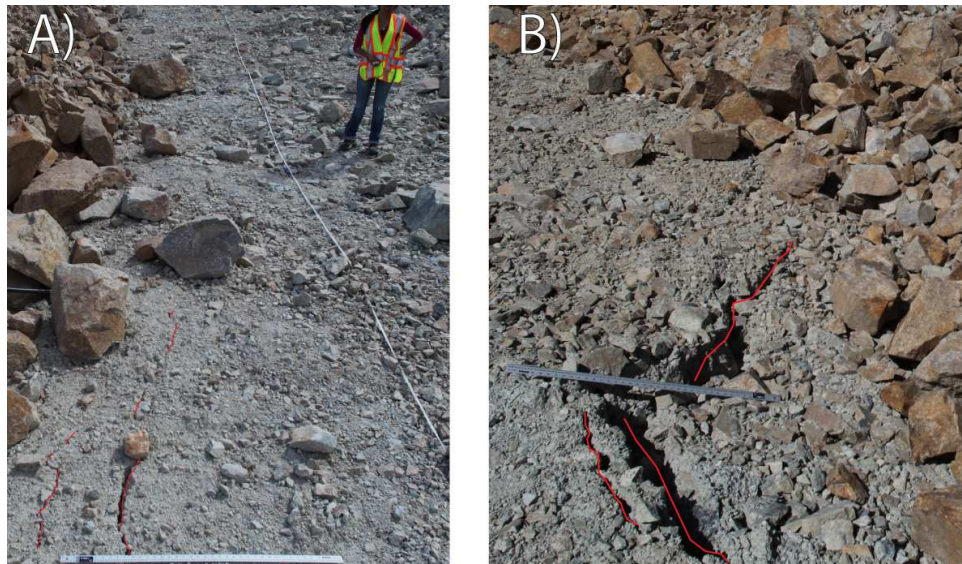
8: Tension crack development in floor of the RL + 1400 m bench looking south (A); and looking North (B).
